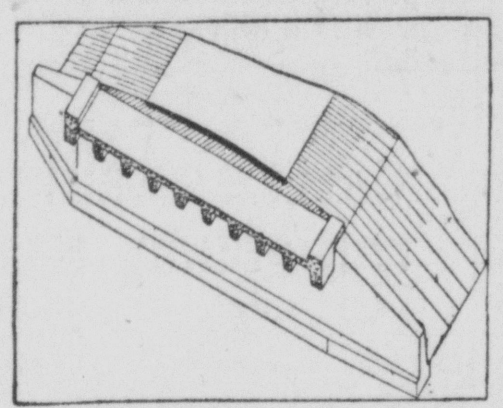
CONCRETE CULVERT STEEL I BEAMS INCASED IN CONCRETE.
